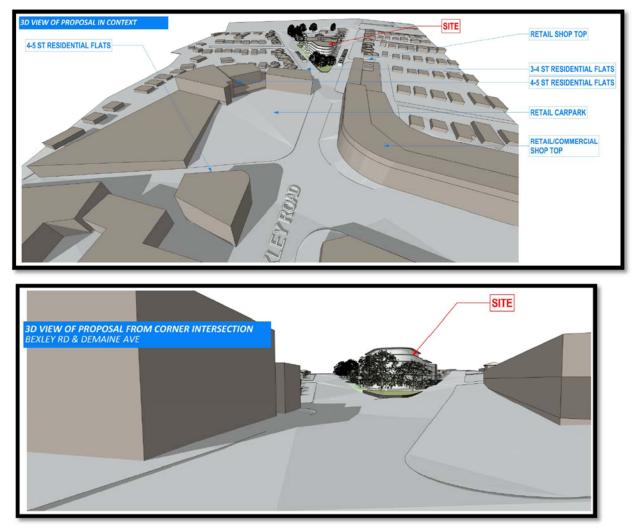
3D Views of Planning Proposal (Source: Proponent's Planning Proposal)
